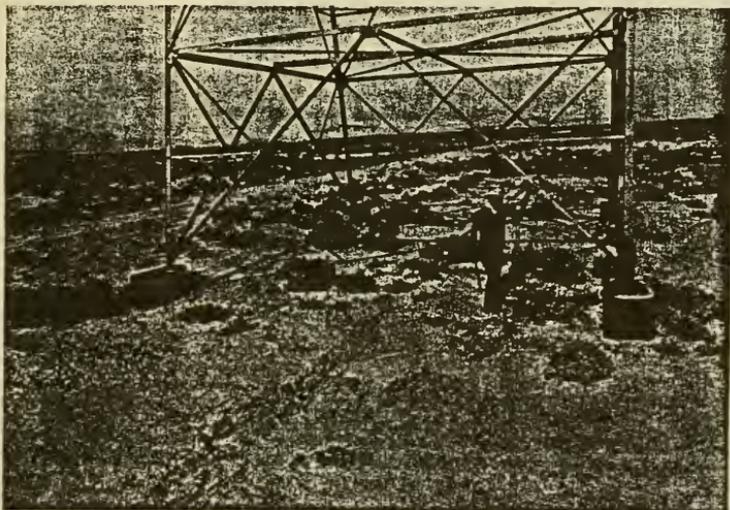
Transmission tower, Lucerne Valley Playa. Towers were placed about 1930 to supply power for construction of Hoover Dam. Footings are about 6 m deep. Giant desiccation fissures have initiated erosion around foundations. If left unchecked, this condition could create a hazardous condition during high winds or a seismic event.
